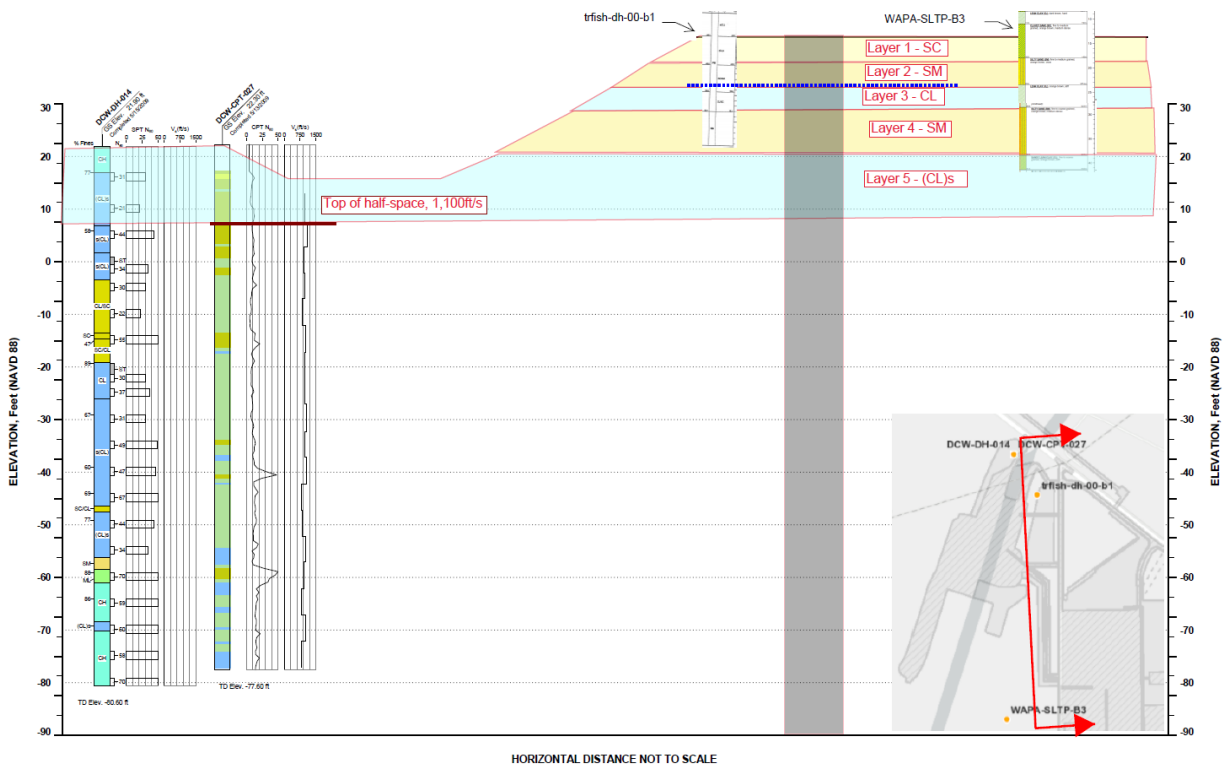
Idealized Soil Profile at Bethany Reservoir Pumping Plant Site
